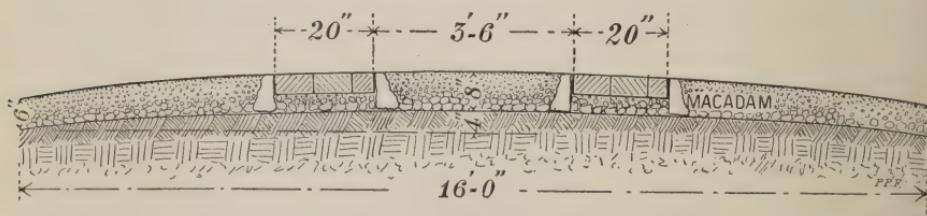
Cross-section of macadam roadway, with brick trackways stone curbed.
